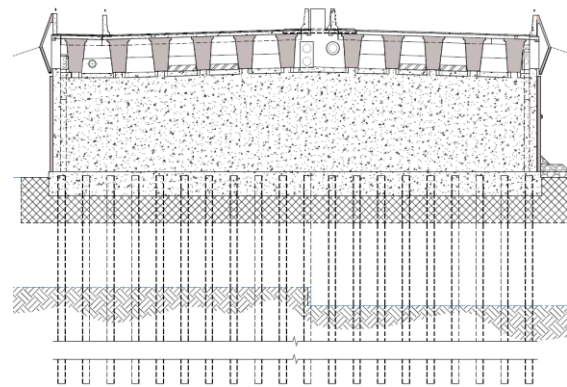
South Abutment Cross Section of Waikanae River Crossing
